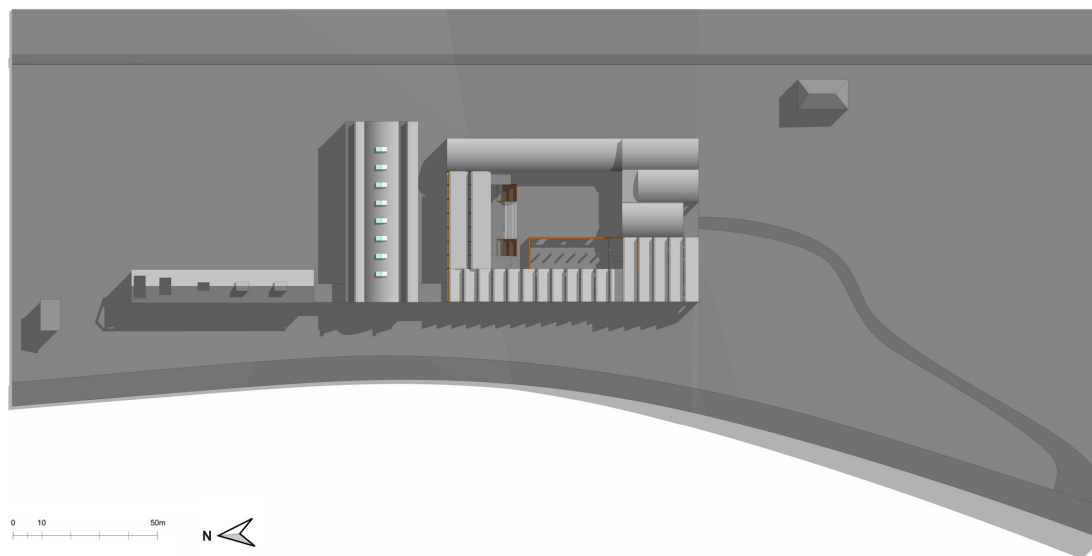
Tobacco Factory in Presenzano: floor plan of the factory roofing systems extracted from the BIM model (model by the Authors).
